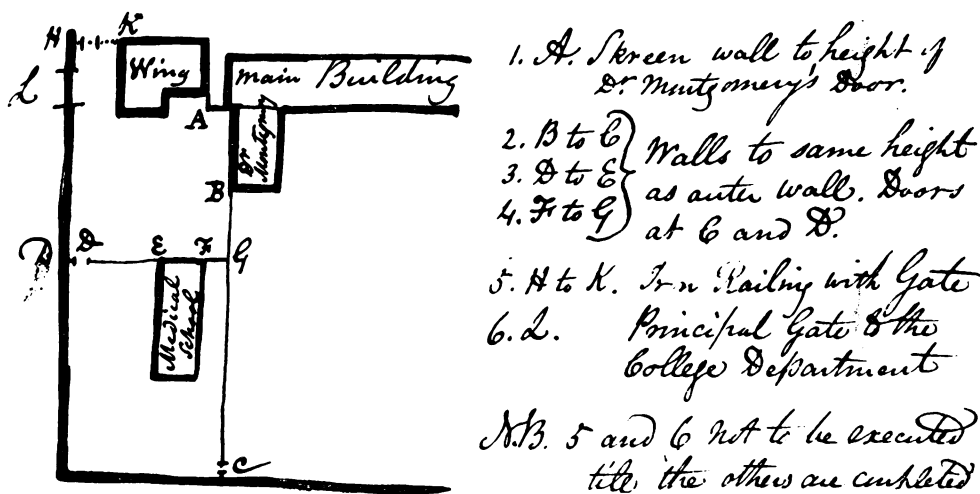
A sketch showing the size and position of the medical school and the proposed enclosure. The top of the sketch is east; the road to the north of the outer wall (HD) is College Square North. Much of the wall (GC) and all the outer wall westward from H still stand. The north wall gate built instead of the gate at L is not shown but was at the north west corner (opposite C) and still survives beside the British Sailors Society and Whitla Institute. (Sketch from minutes of the board of visitors of 12 December 1835—SCH/524/7B/29; reproduced by courtesy of the Board of Governors of RBAI and Public Record Office of Northern Ireland). Intensive search has failed to uncover the architect's plans for the medical school.
